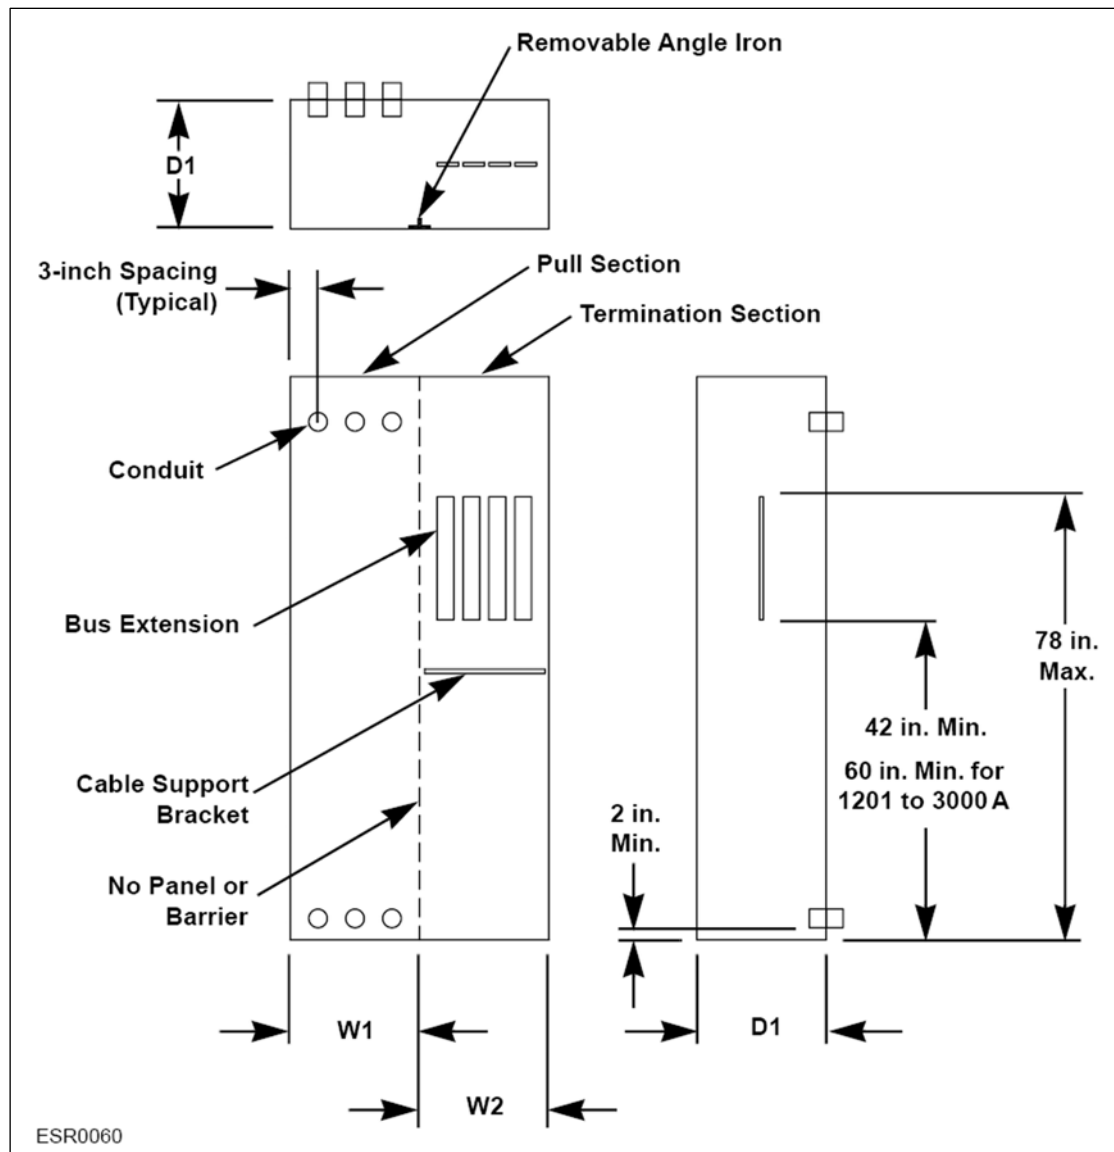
Underground Service Termination in a Pull Section Below Ground Level, Showing Pull Section with Back-Entry Conduits at the Top or Bottom
